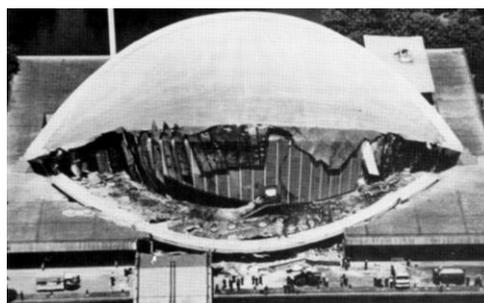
Berlin Congress Hall (ID-19). View from the South on the collapsed roof overhang in 1980 (Helmerich and Zunkel, 2014).
